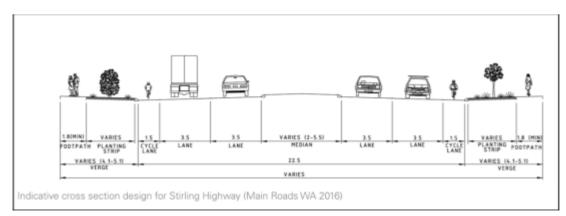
Suggested layout Stirling Highway by Main Roads (Appendix A, page 57).
